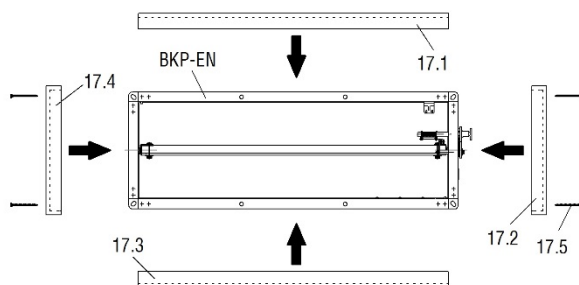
BKP-EN with installation frame type ER-P1 (loose)
